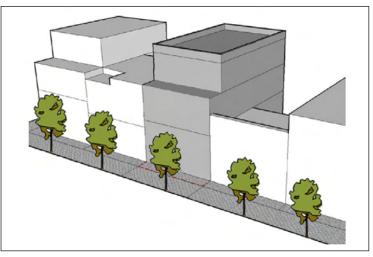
Where neighboring buildings are three stories or lower in height, newer taller buildings should consider matching lower facades to those of adjoining lower buildings with upper floors set back.
